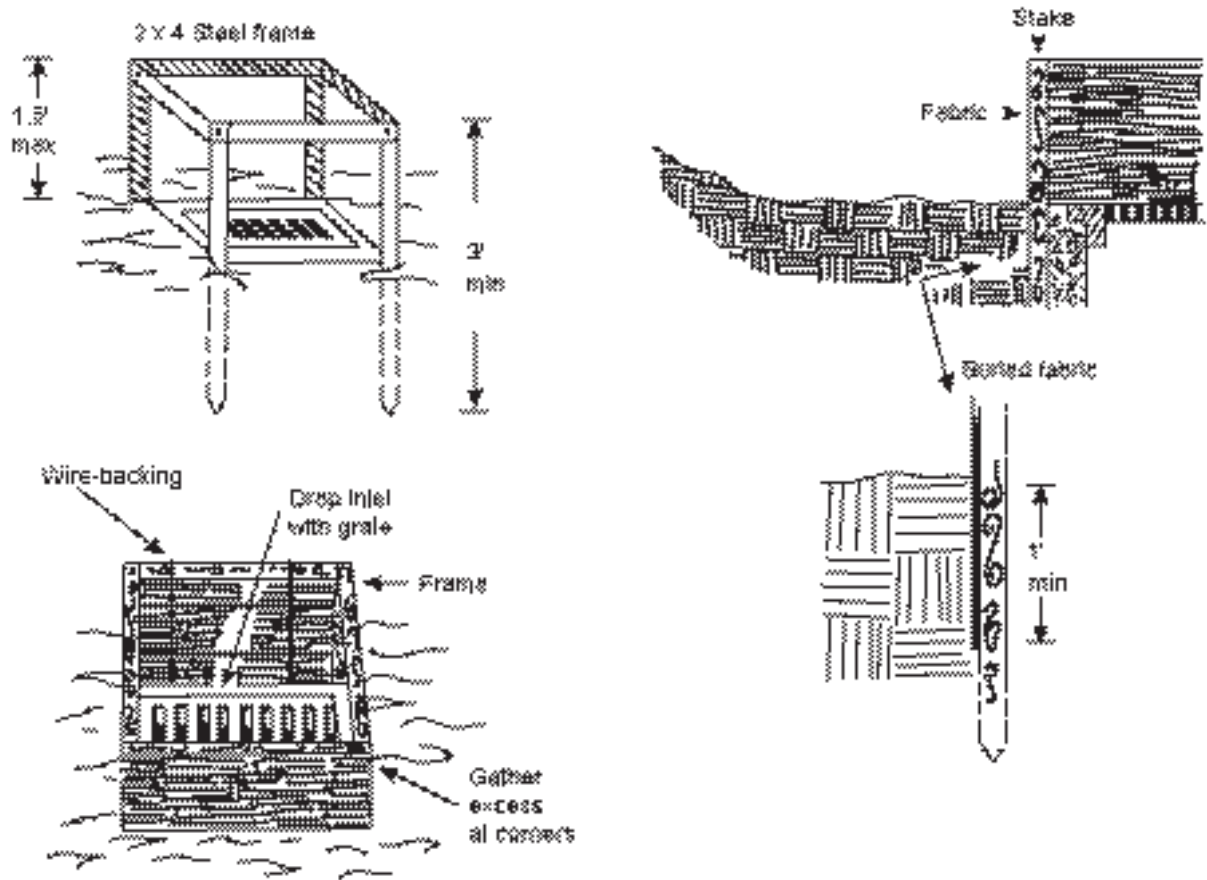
Fabric and Supporting Frame For Inlet Projection
